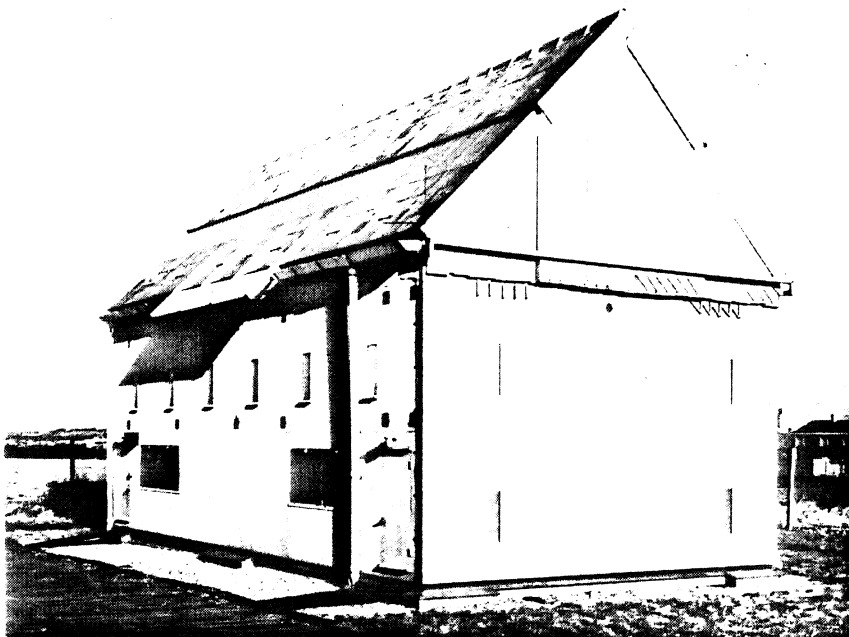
Experimental building with 45° roof pitch, showing eaves overhang
